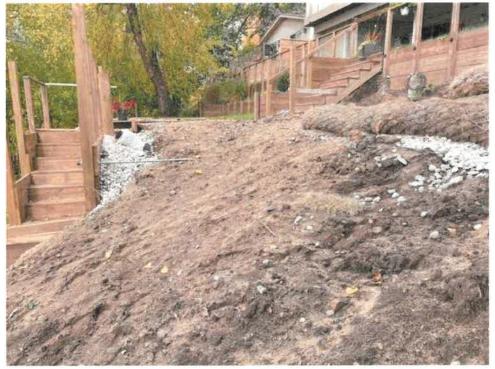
Looking north from south property line detailing French drain outlet into stone fill of lower retaining wall.
